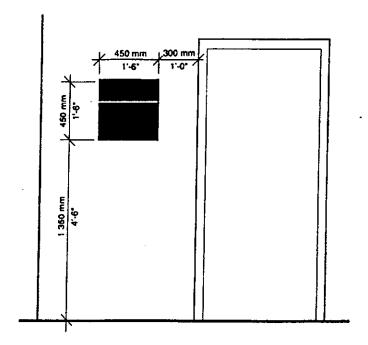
Military Building Entry Sign Type B4 Standard Layouts.
